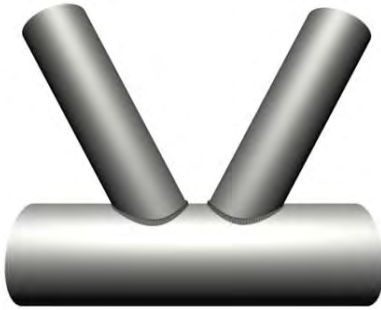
Direct welding of tubulars (Albiez et al. 2013)
